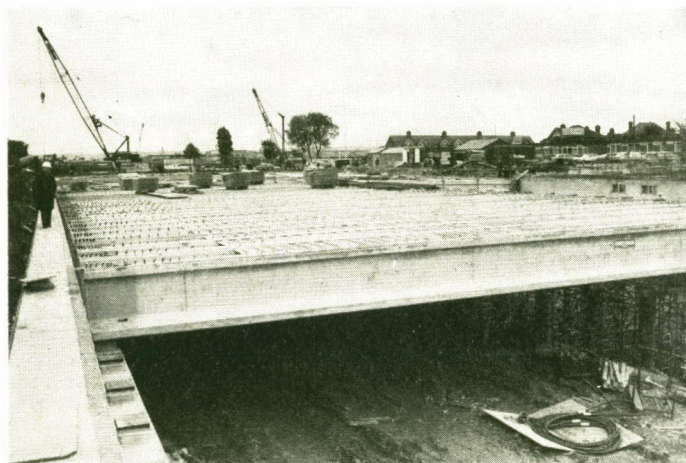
Precast concrete beams spanning each carriageway of the tunnel between diaphragm walls and central piers
